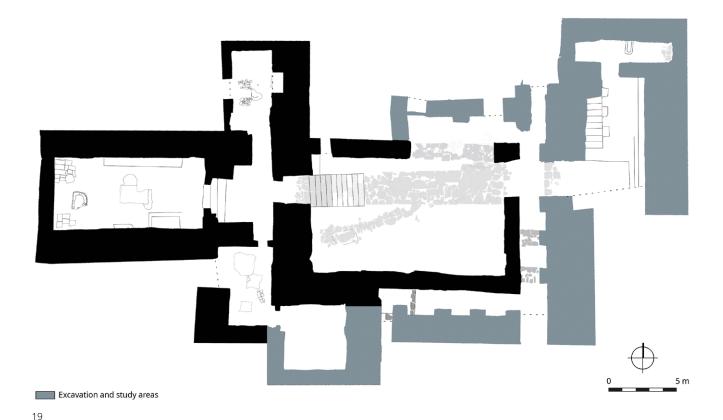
Planimetry of the Casas del Turuñuelo building showing the areas around the courtyard, currently being excavated and studied.
